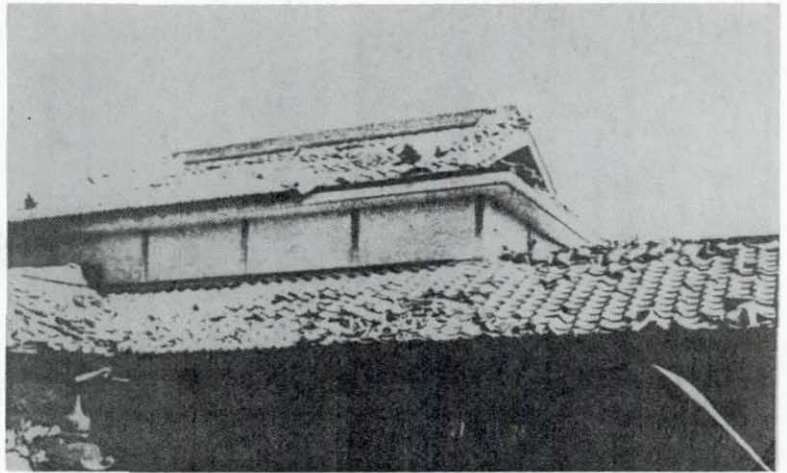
DAMAGE TO TILE-ROOFING WITH BED BOARDS
